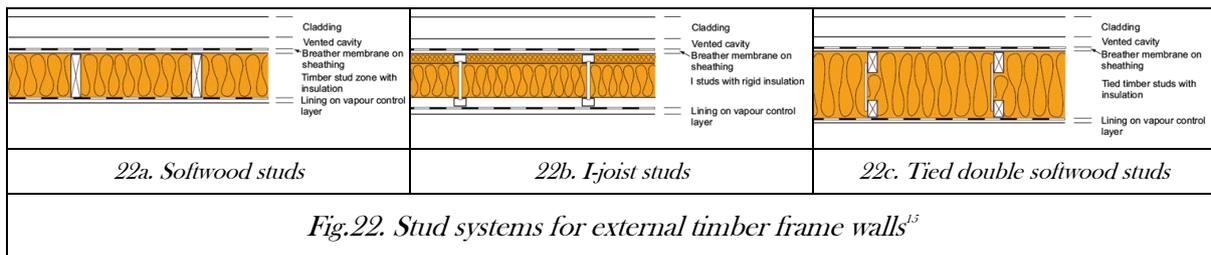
Stud systems for external timber frame walls<sup>15</sup>
